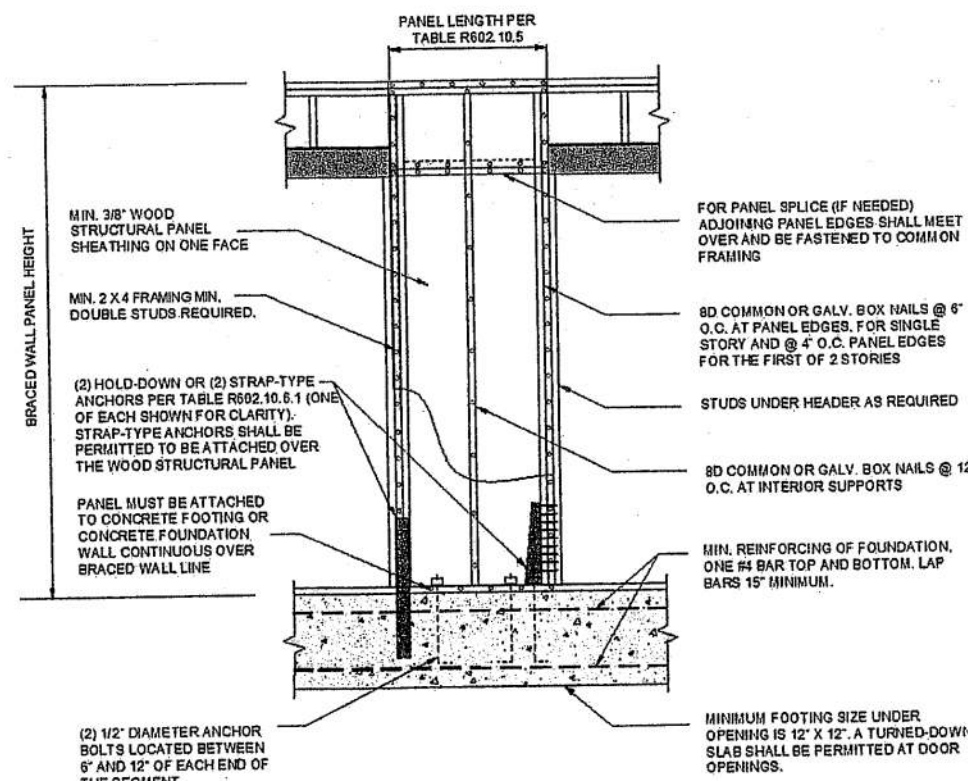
METHOD ABW—ALTERNATE BRACED WALL PANEL
